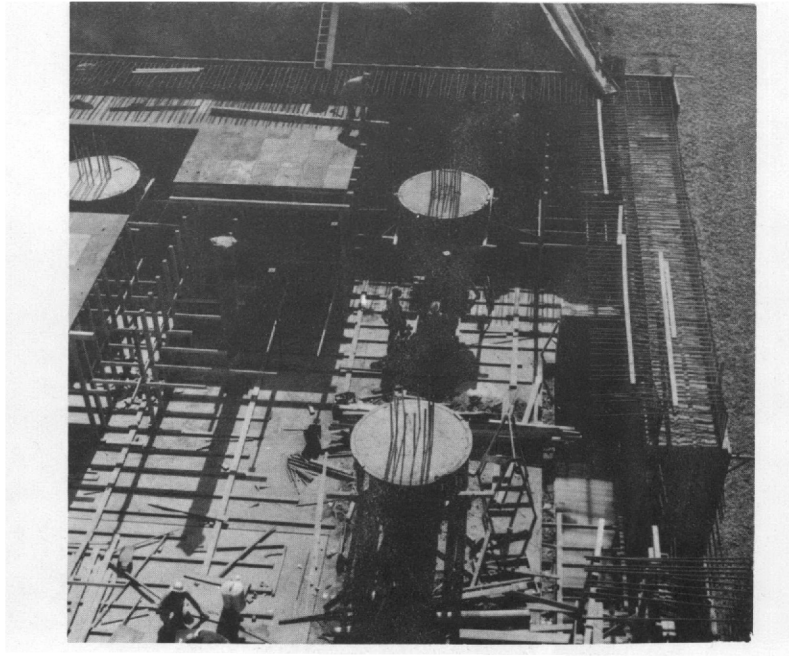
Aerial view of structure while erecting roof-slab formwork.
